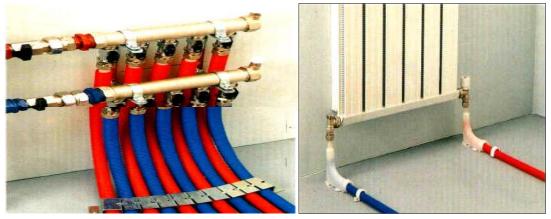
Radiator Collector Details (Karakoç, 1999)
